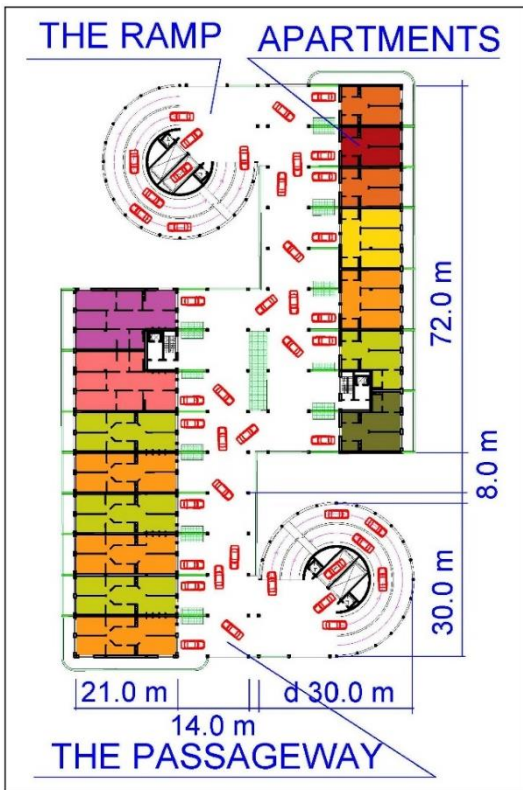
A variant of the linear layout of the house with individual parking lots in front of the entrances to the apartments (circular car ramp on the side) – a typical floor plan
